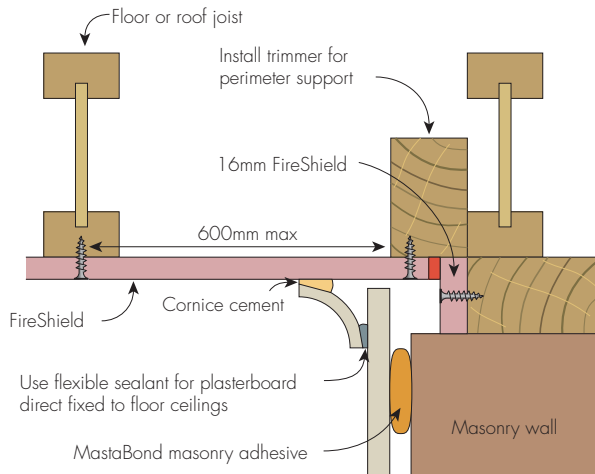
Fire Rated Ceiling to Masonry Wall
